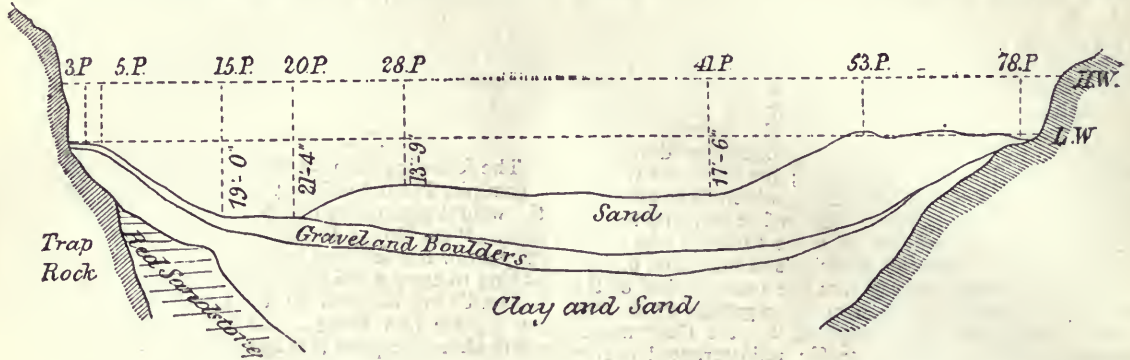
Section of river. Horizontal scale 2,000 feet to 1 inch. Vertical scale 50 feet to 1 inch.
